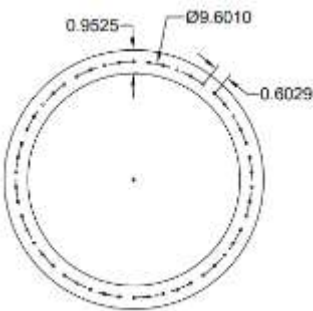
200 m cross section at 50 m, 50 ducts
